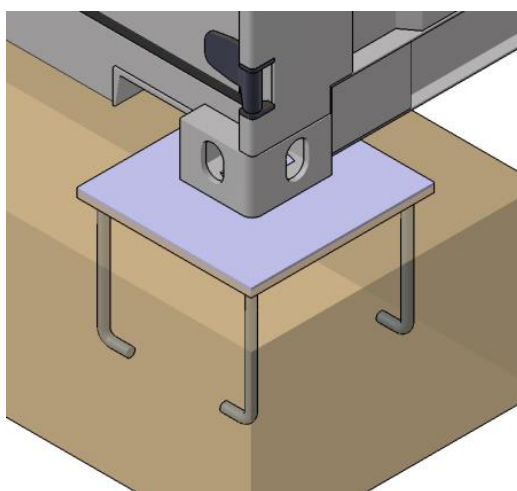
1 (1) Schematic diagram of container welding and fixing.
